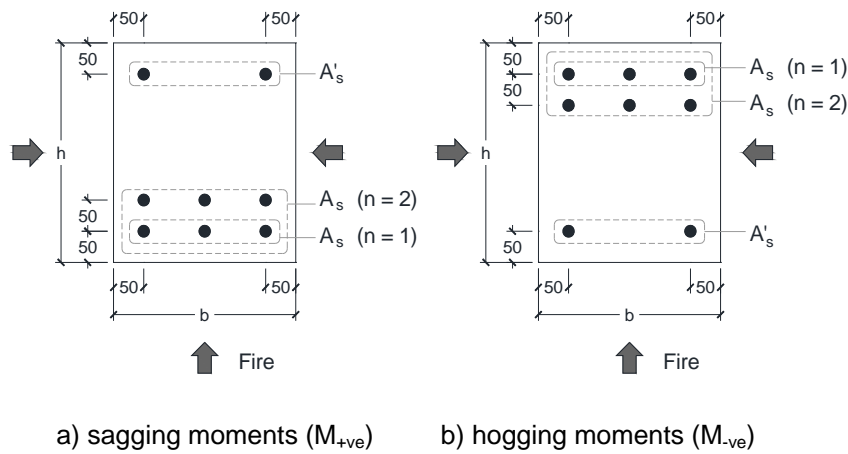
Typical cross-sections for the parametric study beams (Dimensions in mm)
